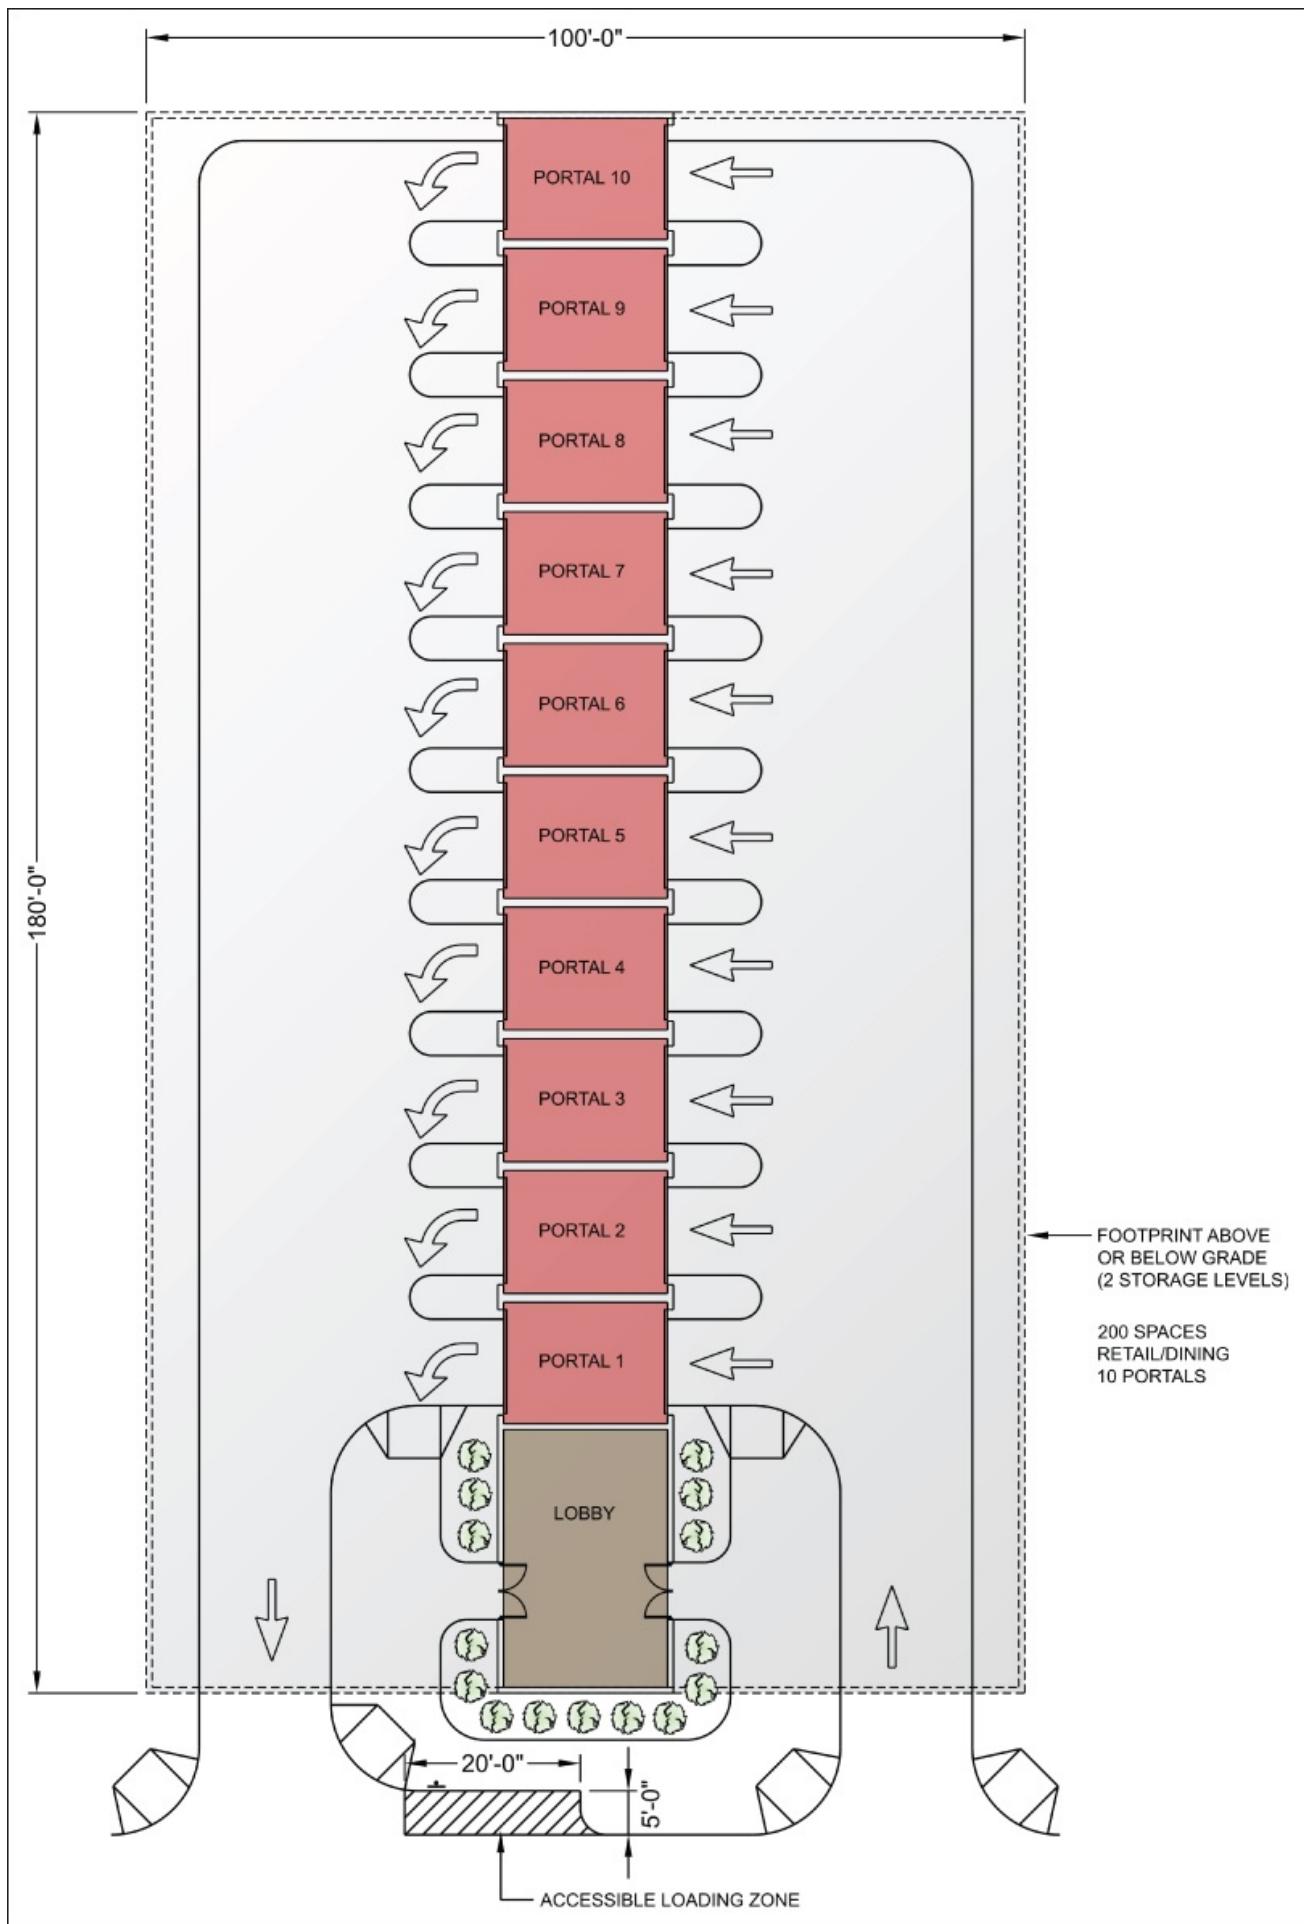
AMPF Loading via Off-Street Access Aisles
